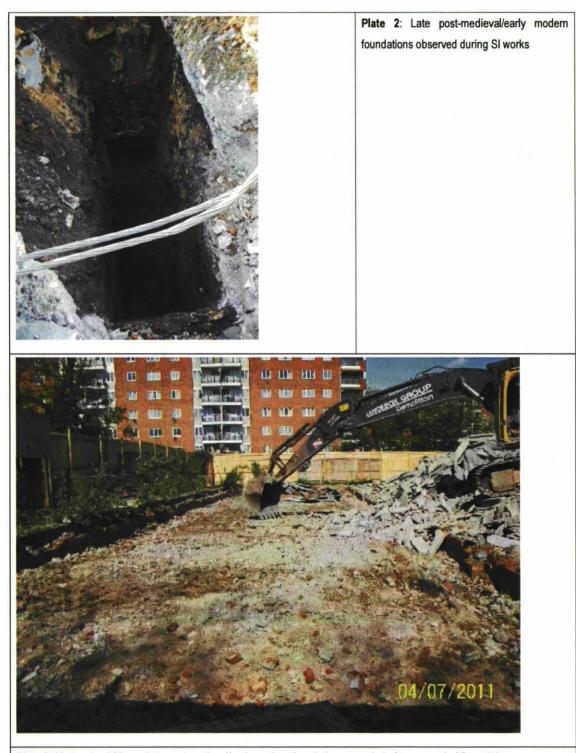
Modern backfill over late post-medieval/early modern foundations revealed after removal of floor slab
